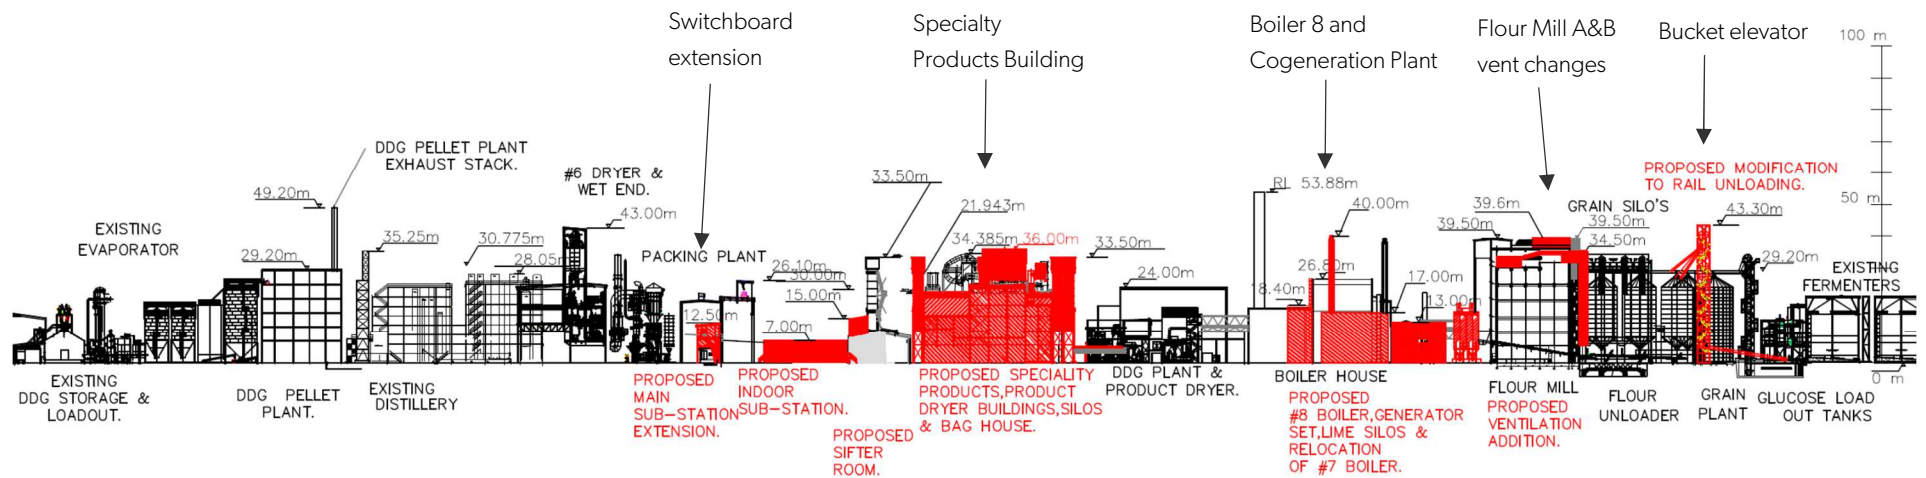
Elevations of Existing (black) and Proposed Structures (red)
